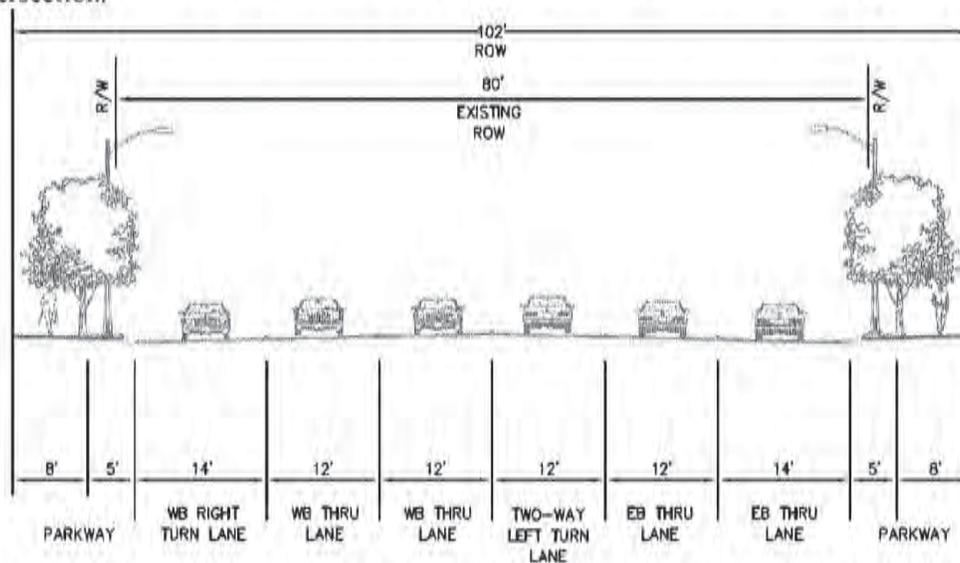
Proposed Cross Section, E Street Between I-5 and 300' East of I-5 N Ramp
